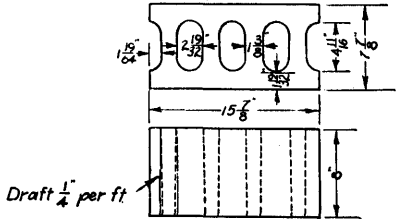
8-INCH SAND AND GRAVEL BLOCK WALL
